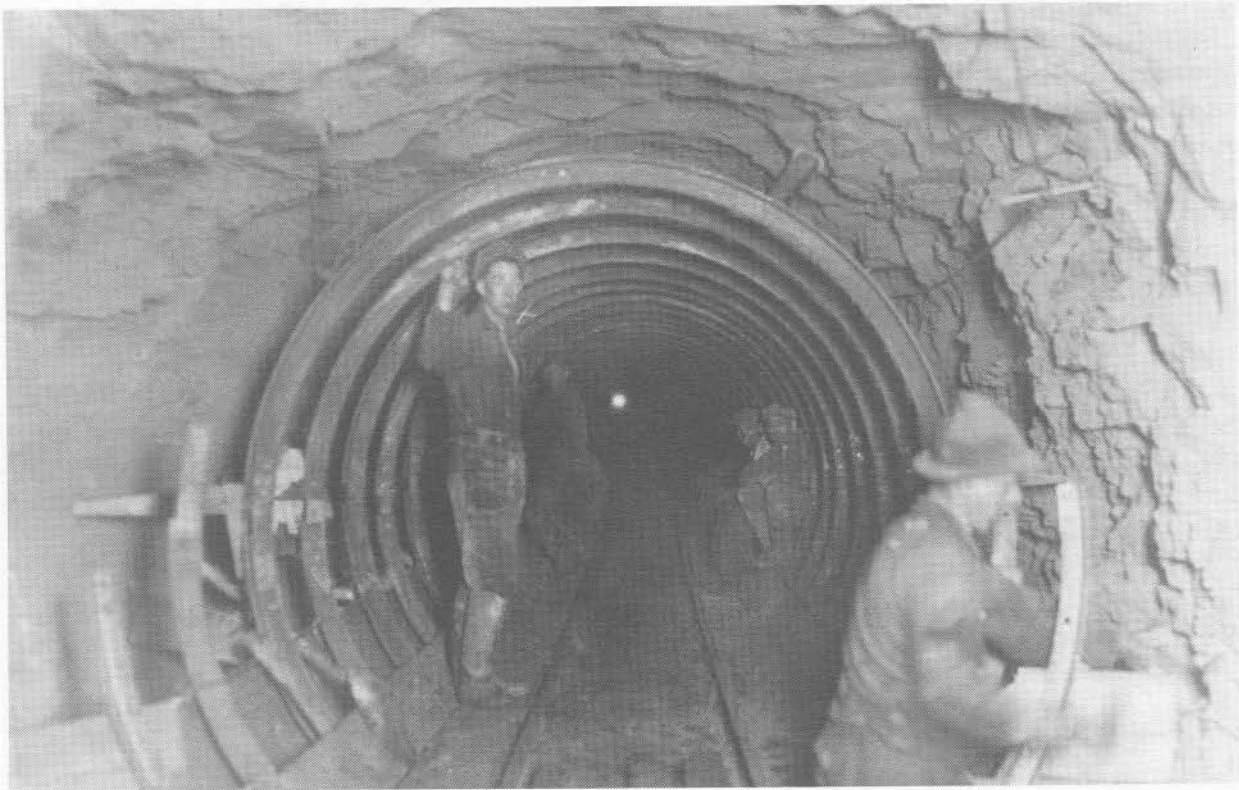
Construction phase of the Missouri Valley Tunnel, February 12, 1926. View is along a segment of the tunnel about 1,400 feet from one of the shafts. The rock walls were supported with temporary forms until a finished concrete liner could be installed.
